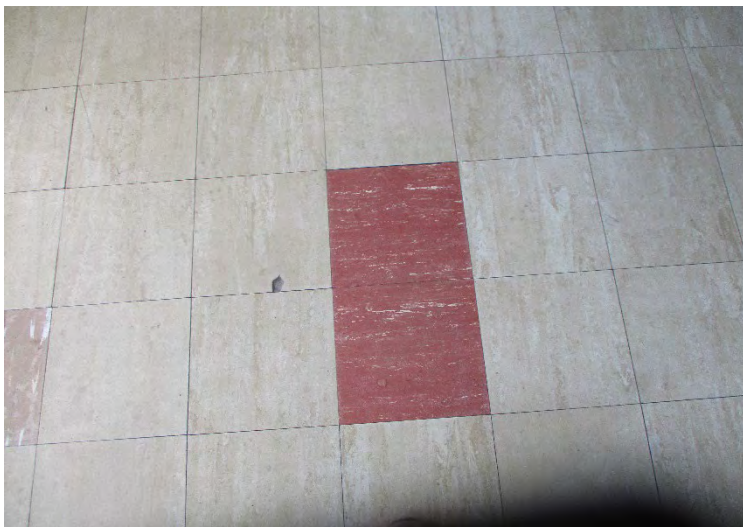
A view of asbestos-containing floor tile in the 5959 Whittier 2nd floor classroom 205
